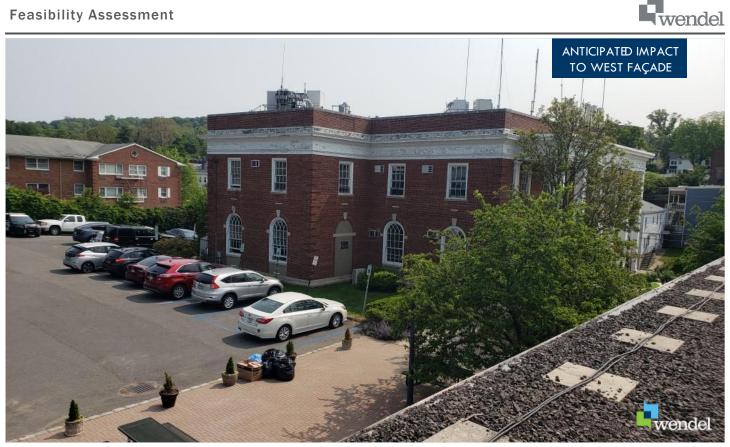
Mockup of locations of penetrations for ventilation at the Village Hall's West façade
